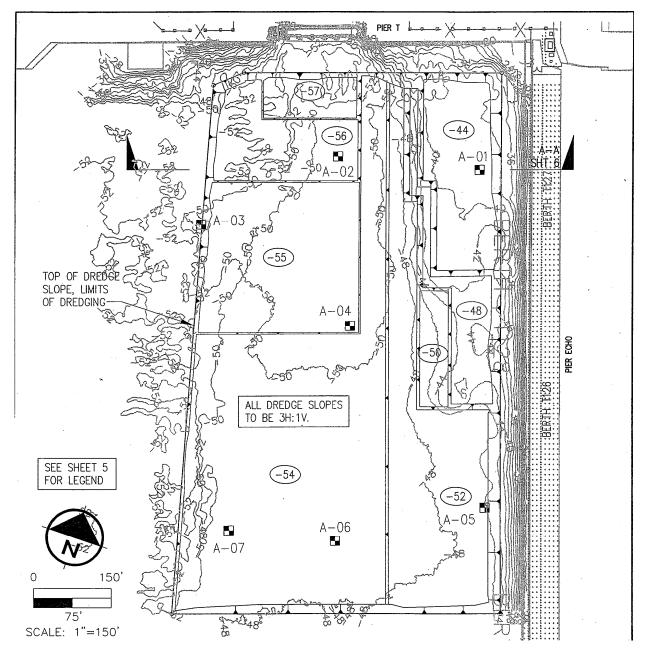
Dredging plan for AOEC-A for IR Site 7.
